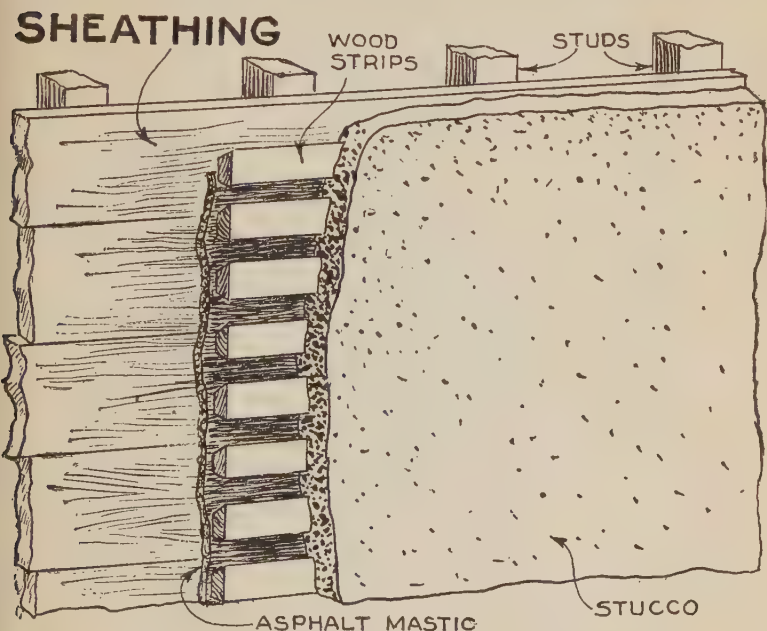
,098.—Stucco applied to old frame building. 2, as placed over sheathing.
